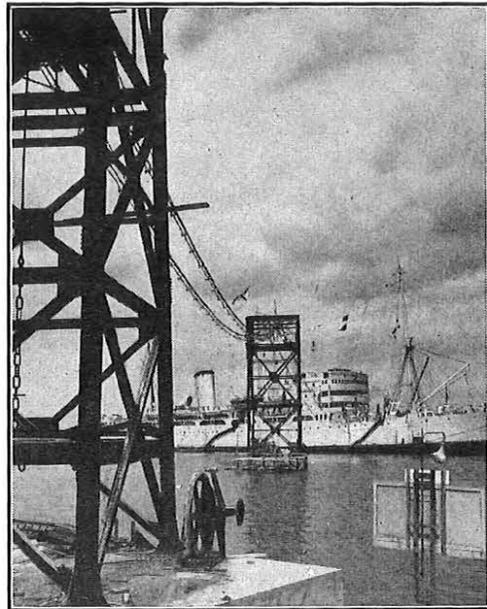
CABLE TOWERS, USED FOR LOADING CABLE INTO THE SHIP
